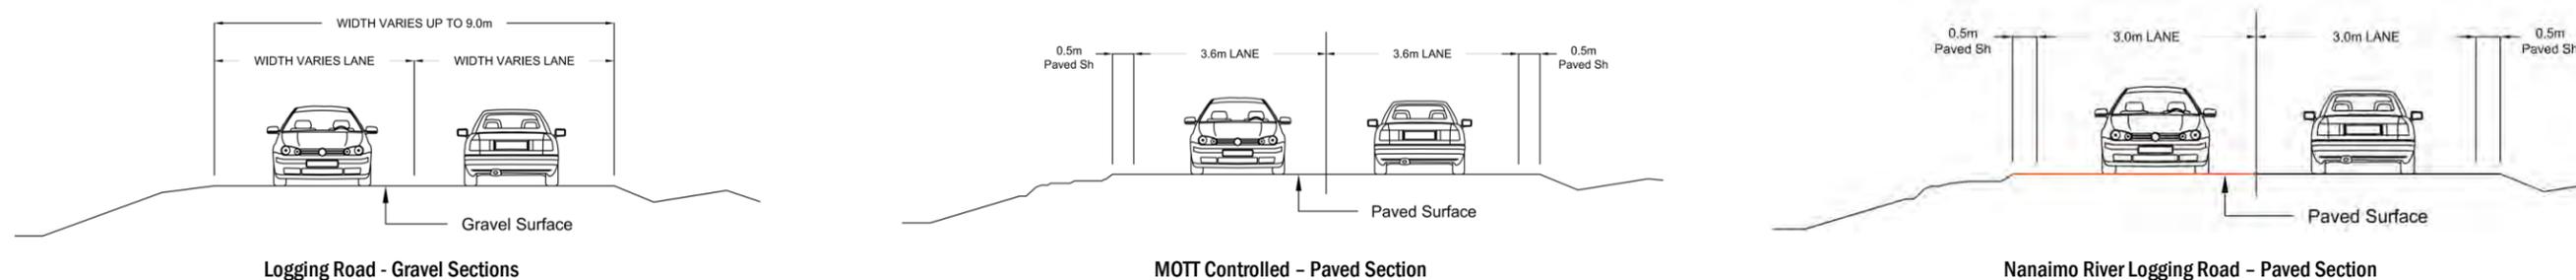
ROUTE 2C - TYPICAL CROSS SECTIONS
